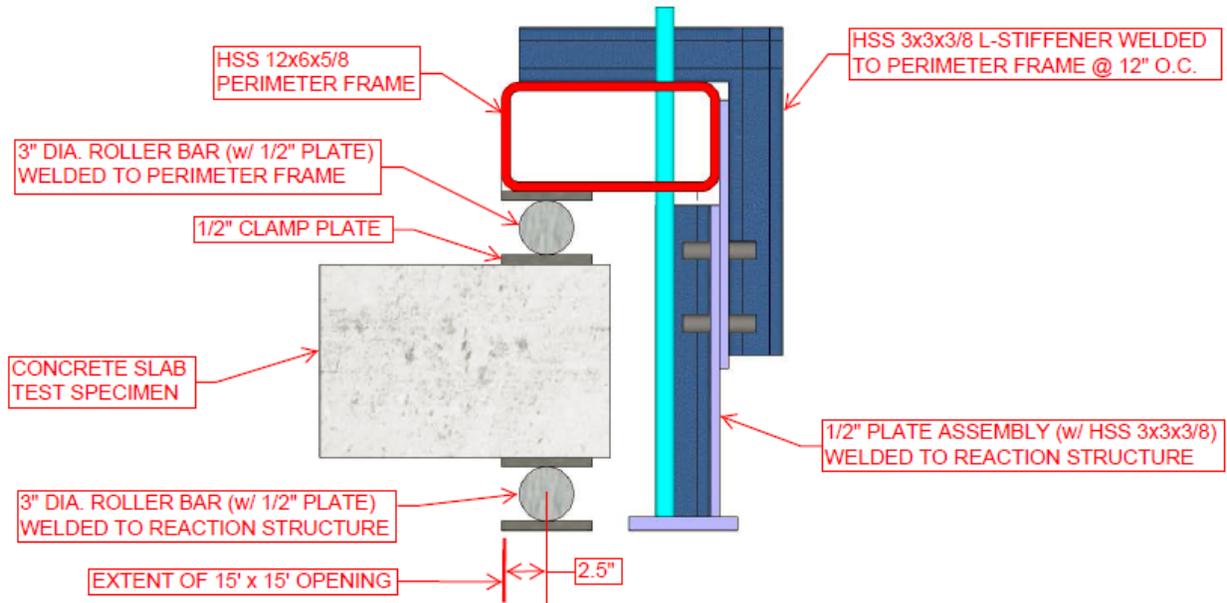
Steel Framing Set-Up 2 Layout (Section View)
